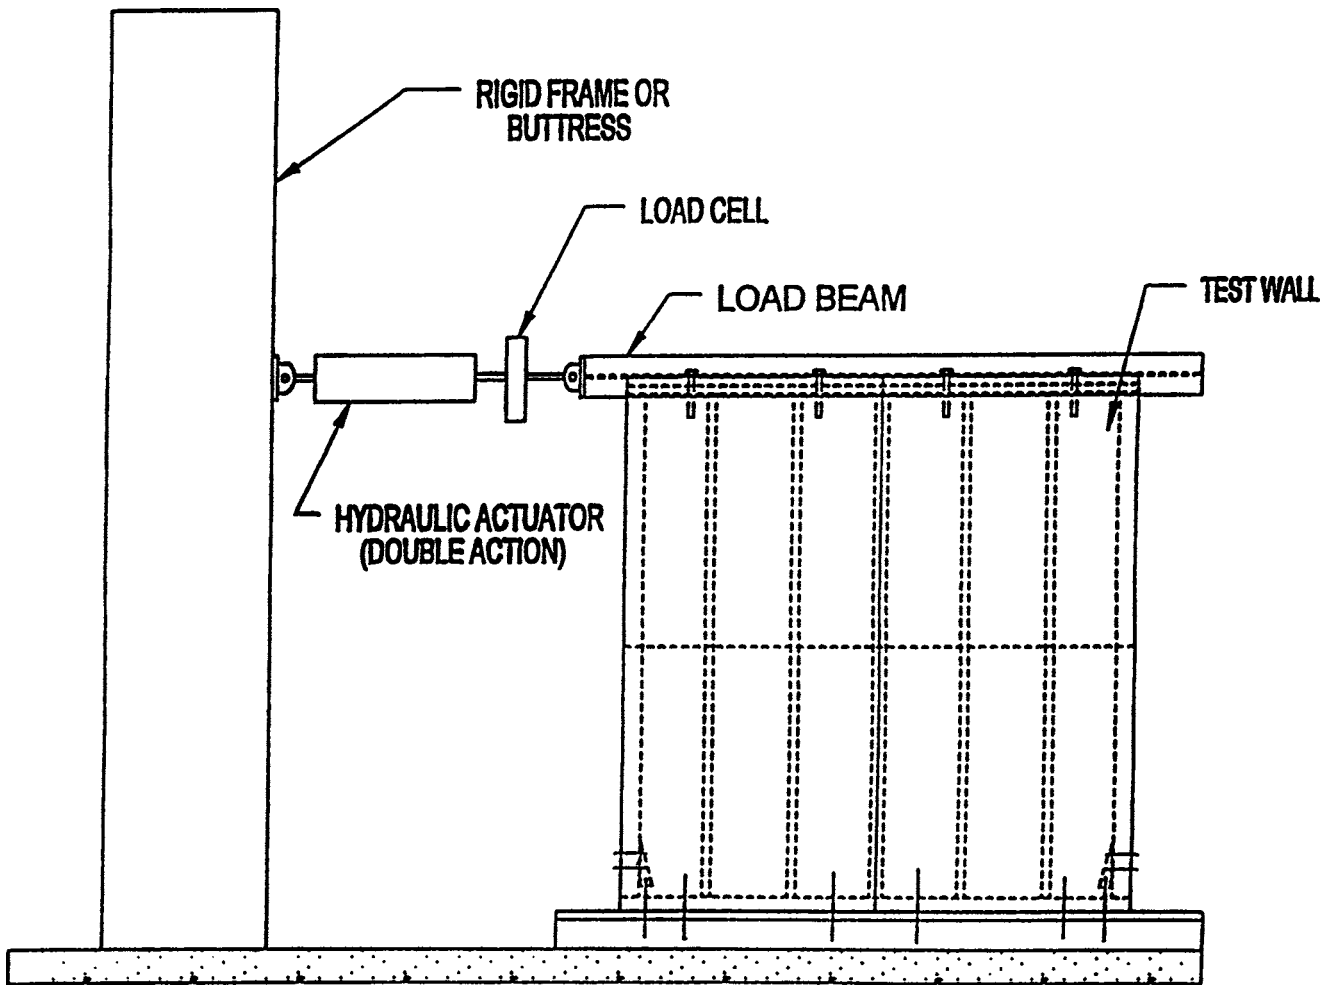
An Example of Test Setup for Shear Wall Specimen
